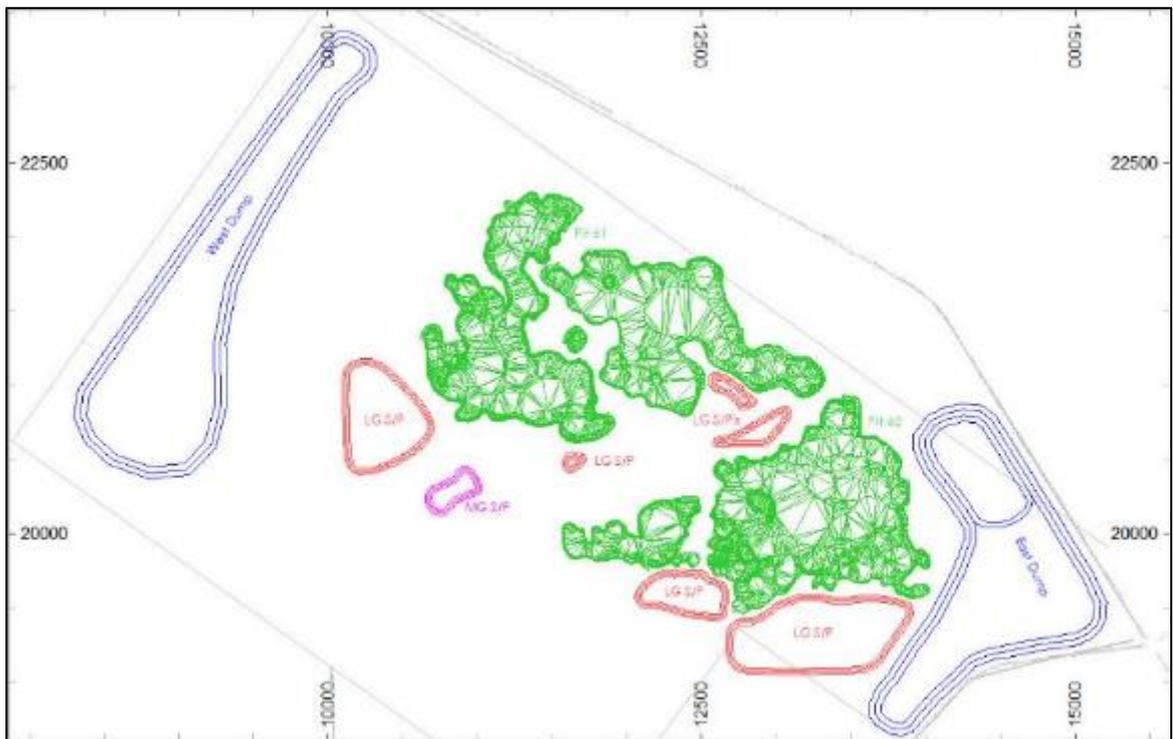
Pit, stockpile and waste dump design – Year 20
